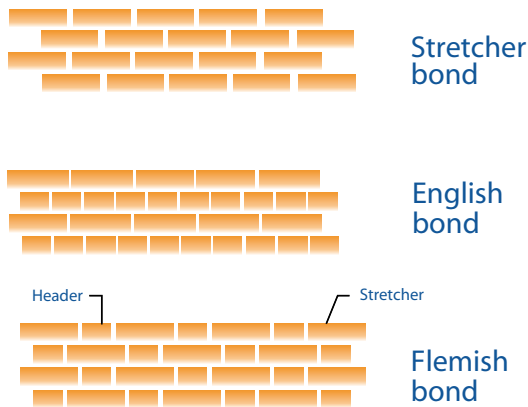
Brick bonds: the lower two examples are likely to be solid walls
